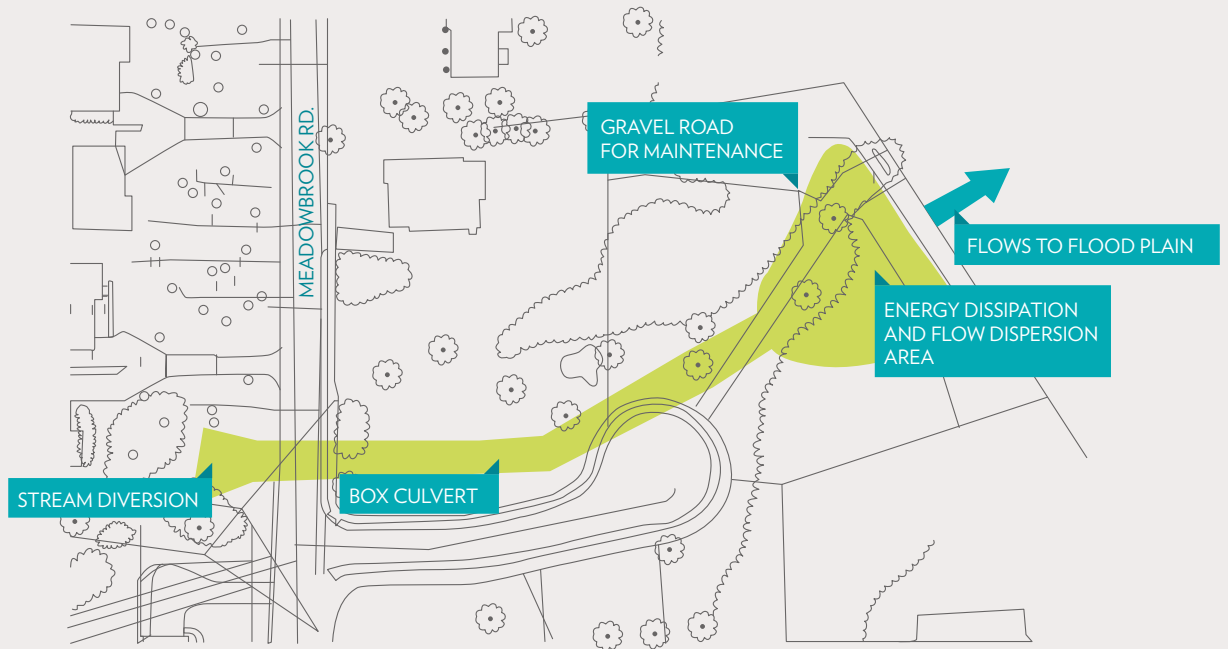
PLAN VIEW OF DIVERSION AND BYPASS TRUNK LINE.
